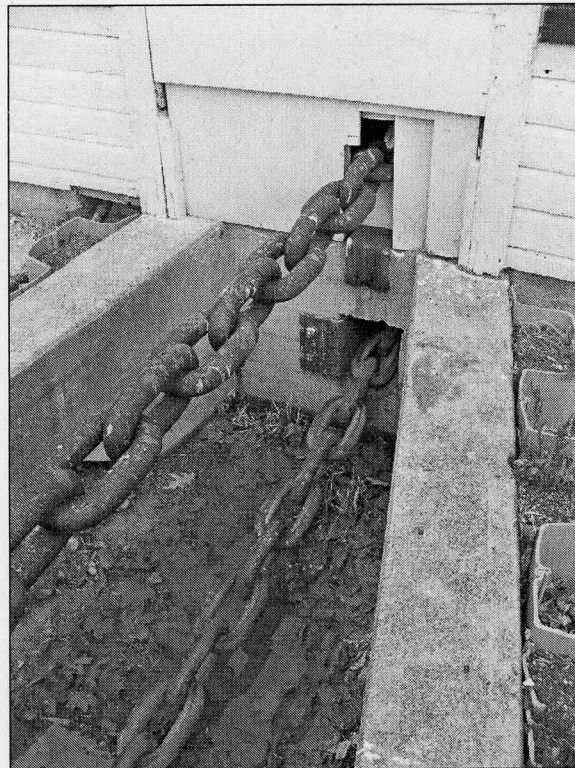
Five-foot-deep, Y-shaped foundation below grade at south elevation of head house, showing in-haul chain as it leads to front of cradle
